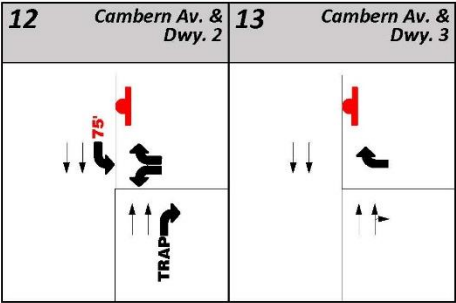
SITE ADJACENT ROADWAY AND SITE ACCESS RECOMMENDATIONS
